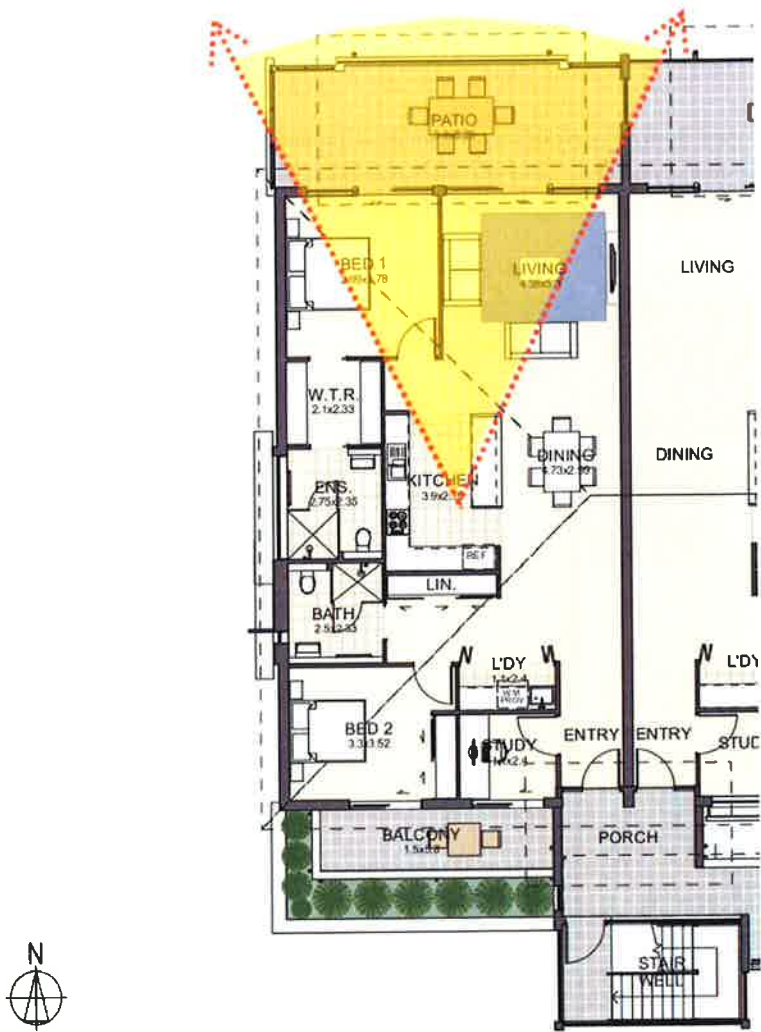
Typical Apartment Floor Plan (Solar Access)
